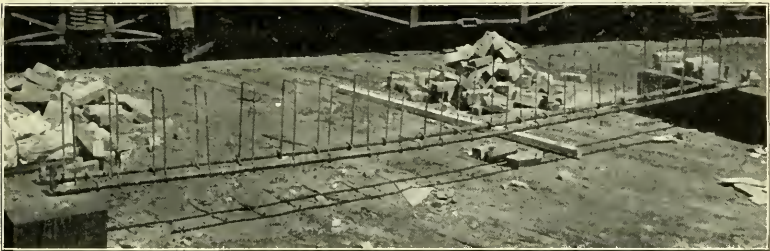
REINFORCEMENT USED IN BRICK BEAM TEST.
